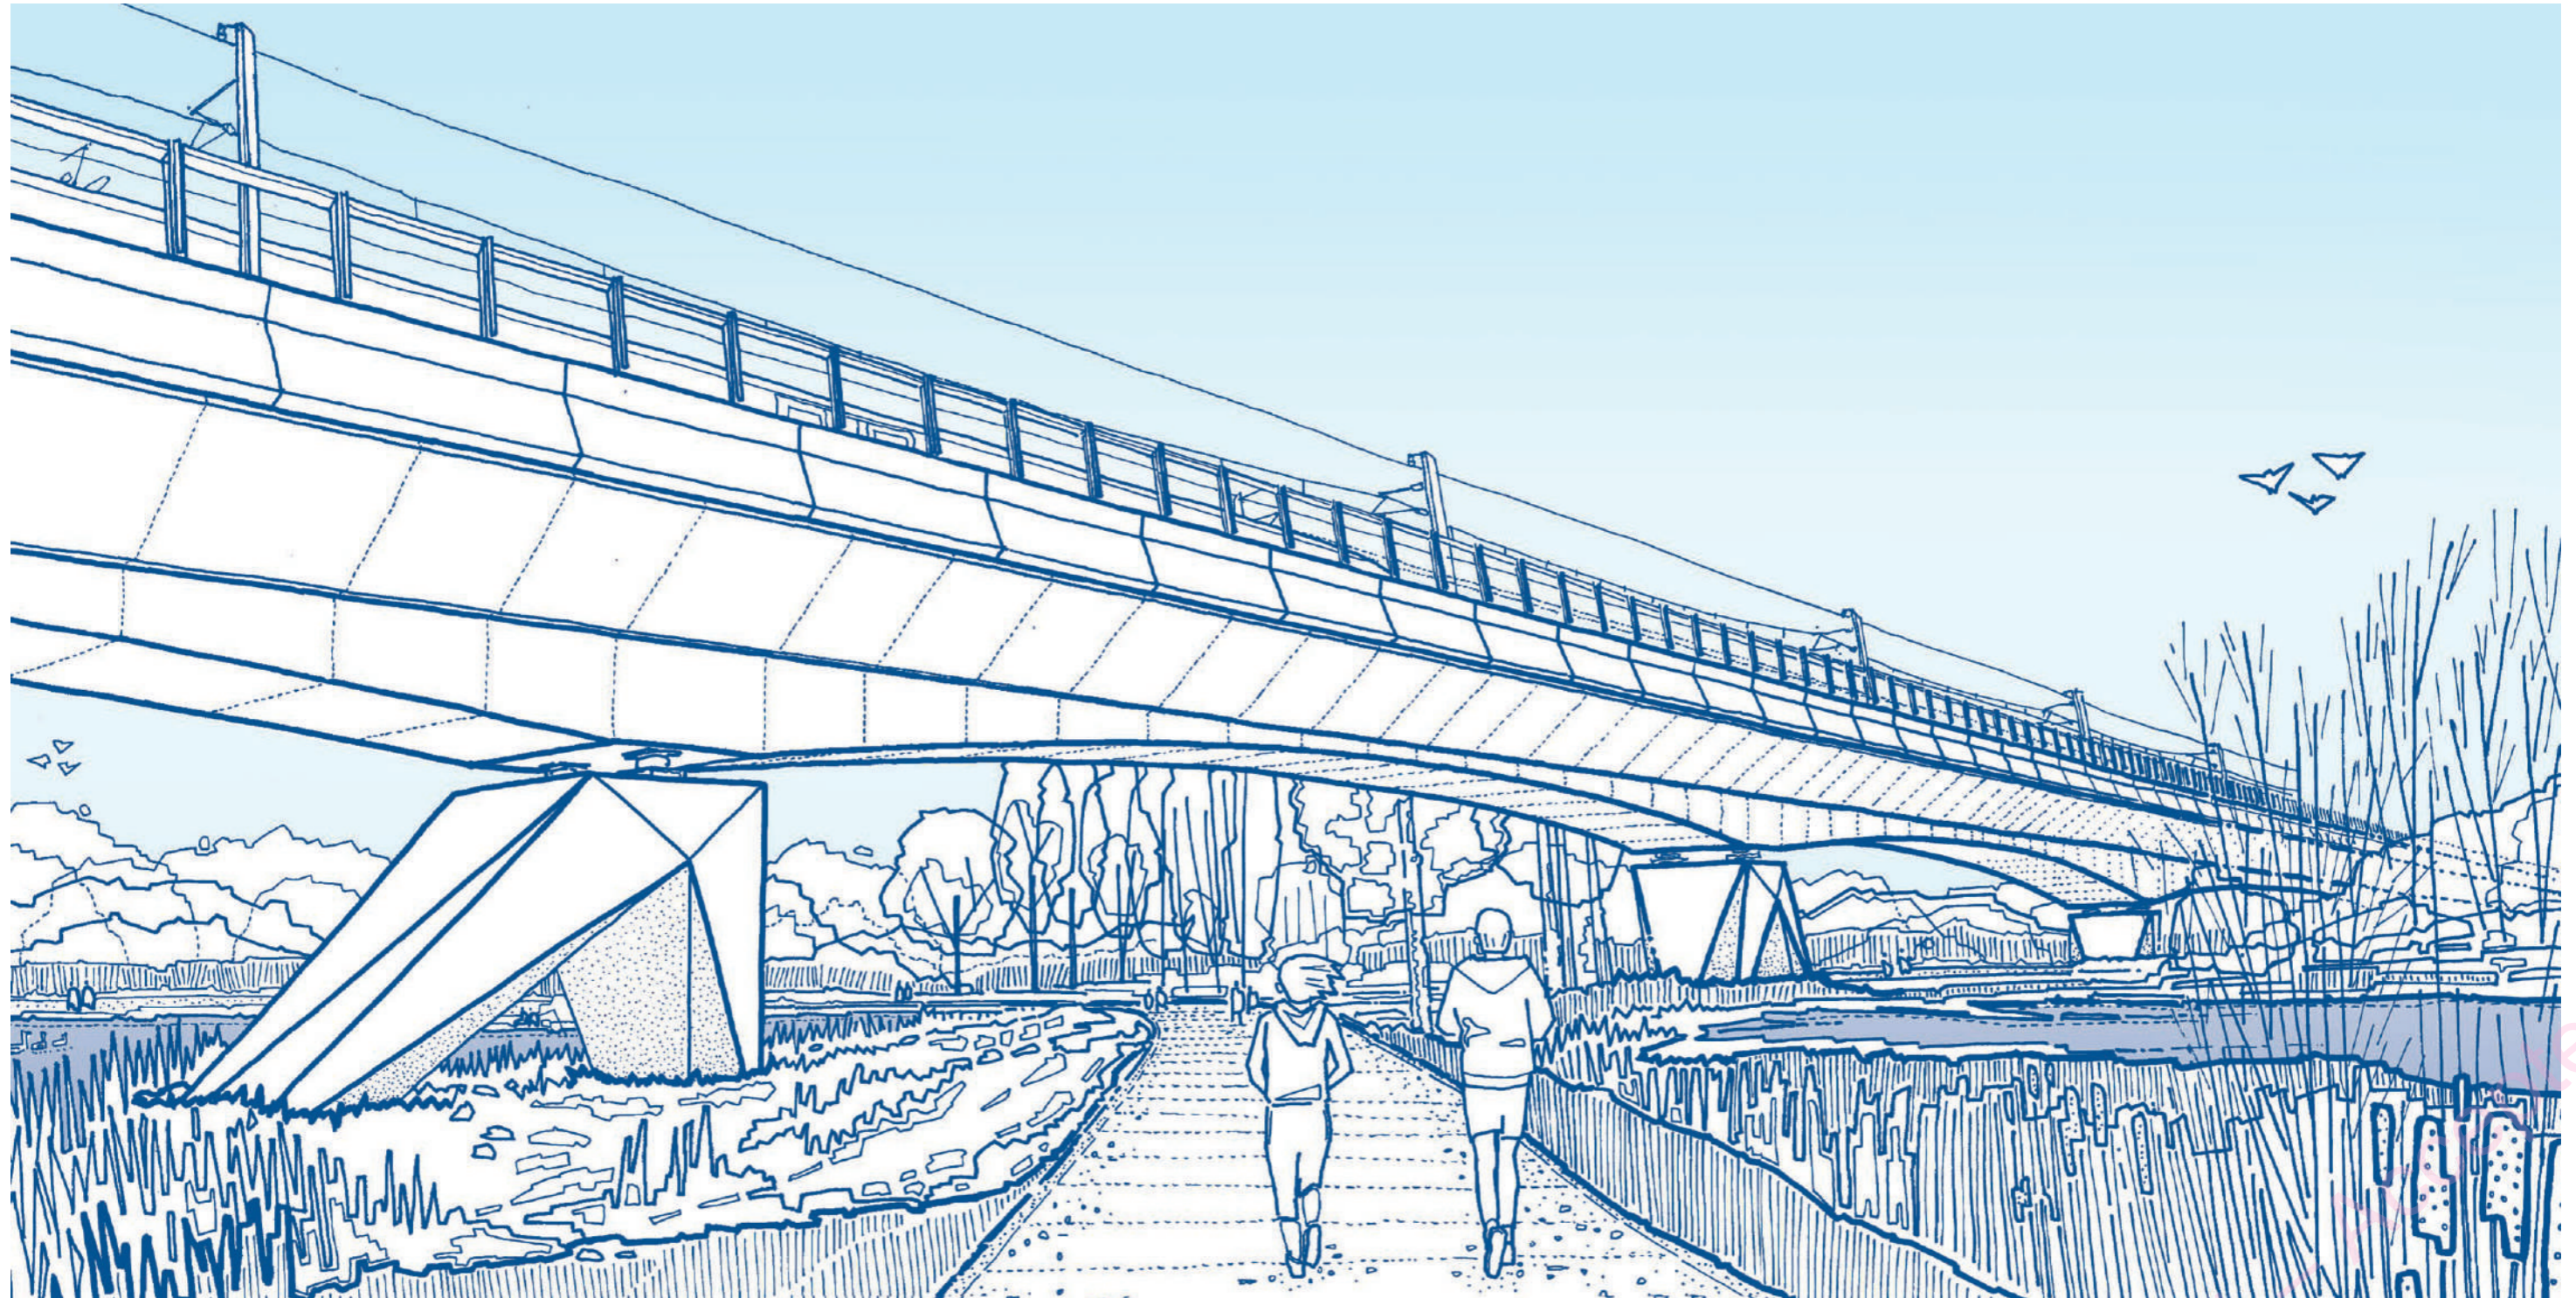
\_ Sketch view - Looking north from Korda Lake perimeter track
